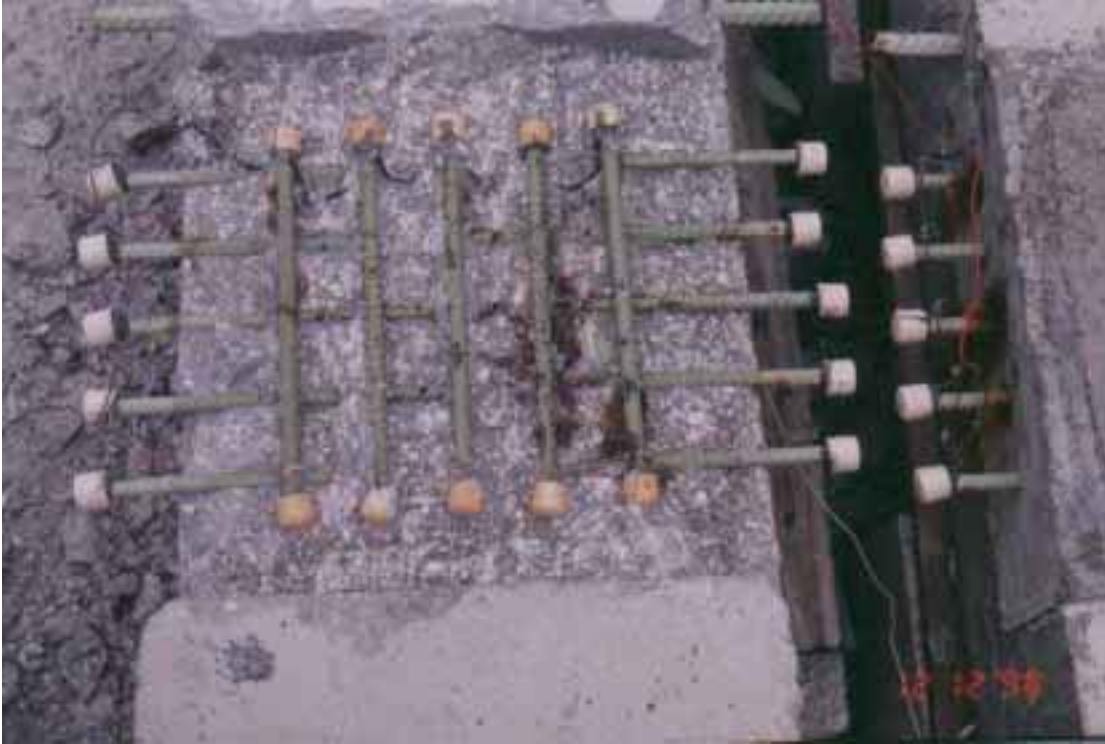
Photograph of the ECR mat from a PCS specimen after removing the cracked and spalled concrete.
